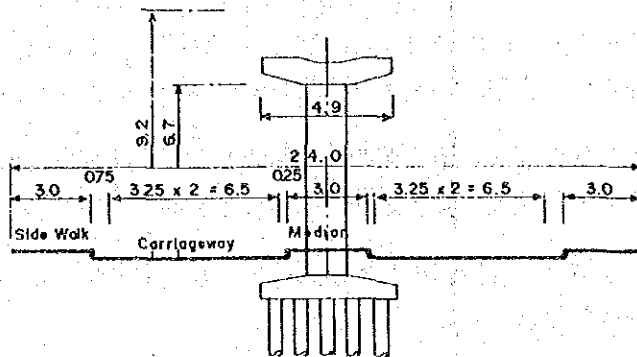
(1) Standard Cross-Section of Route 2
